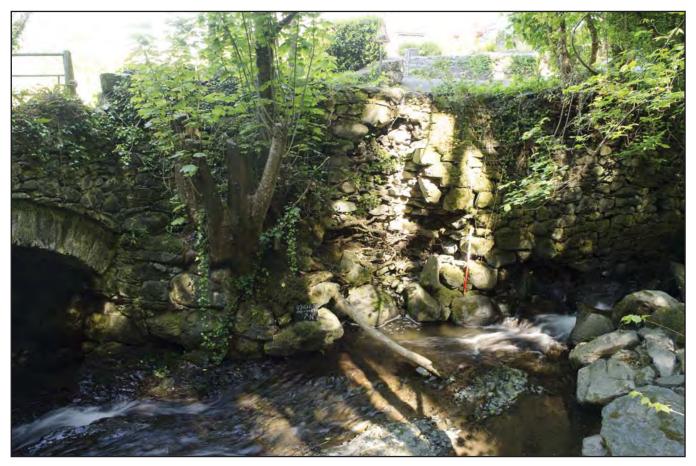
Location at the breach in the retaining wall; scale: 1 x 1m; view from: SE (archive reference: G2616_007).
